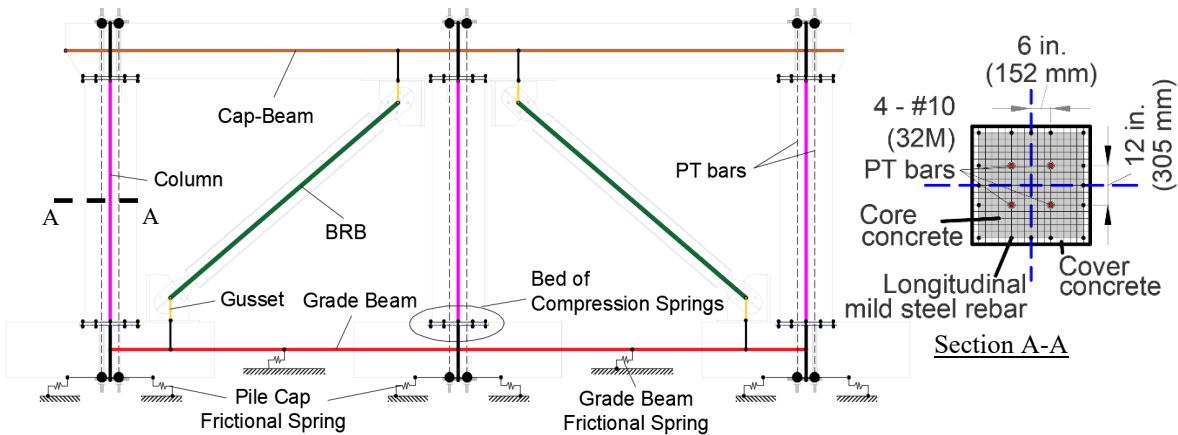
Model layout of three bent specimen: post-tensioned bridge bent with BRB
